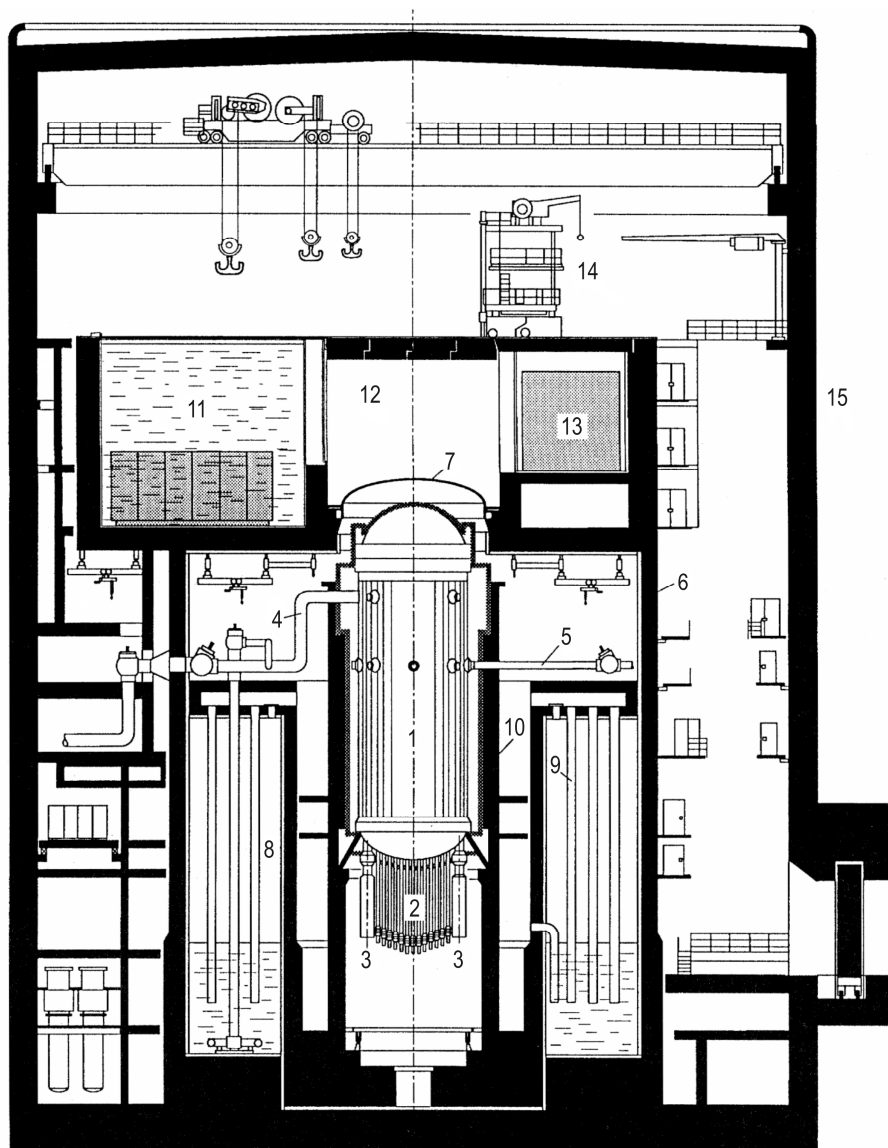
Cross-section drawing of a German BWR, 1: reactor pressure vessel, 2: drives of control rods, 3: main coolant pumps, 4: inner pipes for live steam, 5: pipes for feed water, 6: reactor containment, 7: loading
